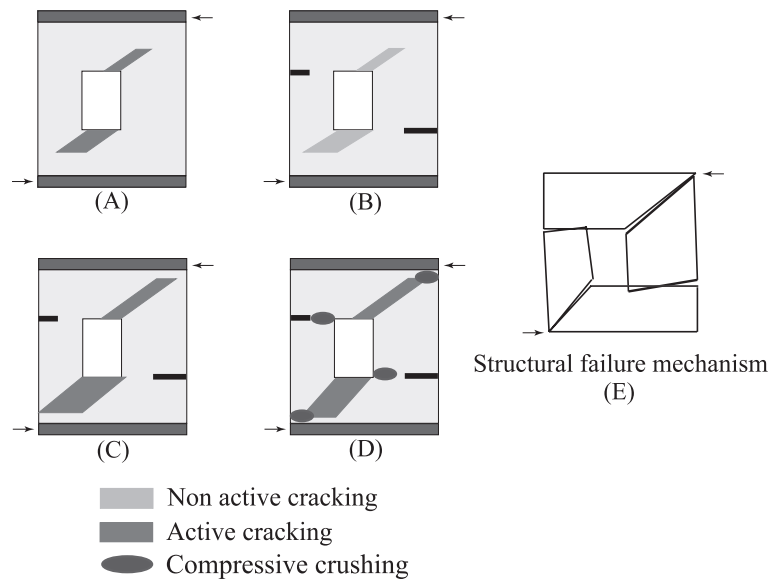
Shear test on a wall with opening – successive cracking states observed in experiments by Raijmakers and Vermeltfoort (1992)
